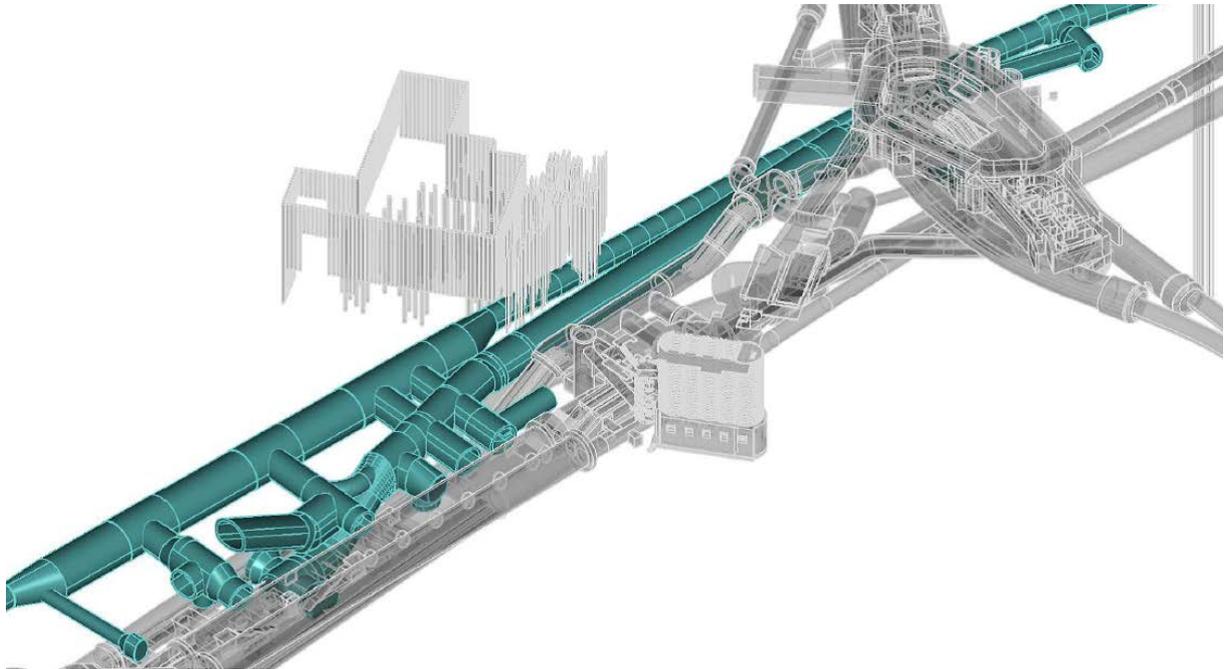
Underground station upgrade London UK (Dr. Sauer & Partners, 2015)
